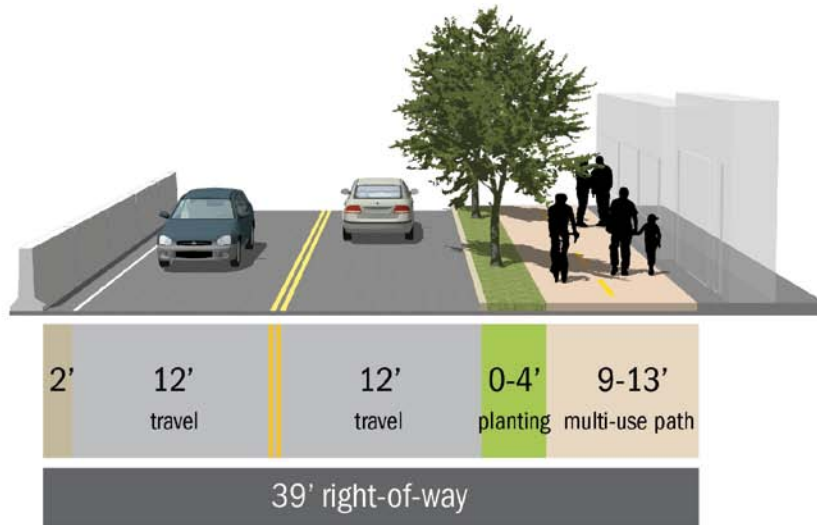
Conceptual Cross-Section for Main Street – South of Beta Street within existing right-of-way (looking north)
